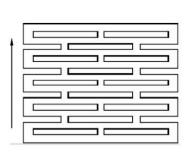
Lightweight concrete masonry unit — Geometry 3/0,8
